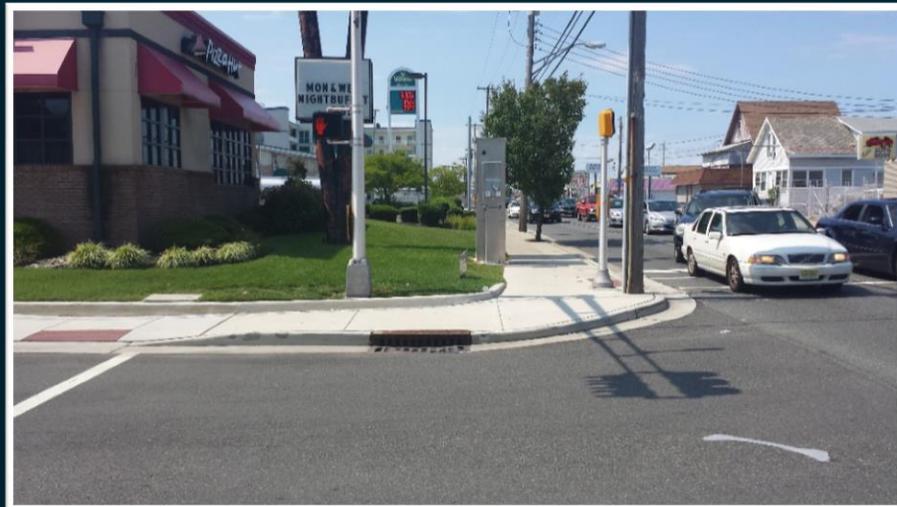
Rio Grande Avenue at sidewalk at Pizza Hut
